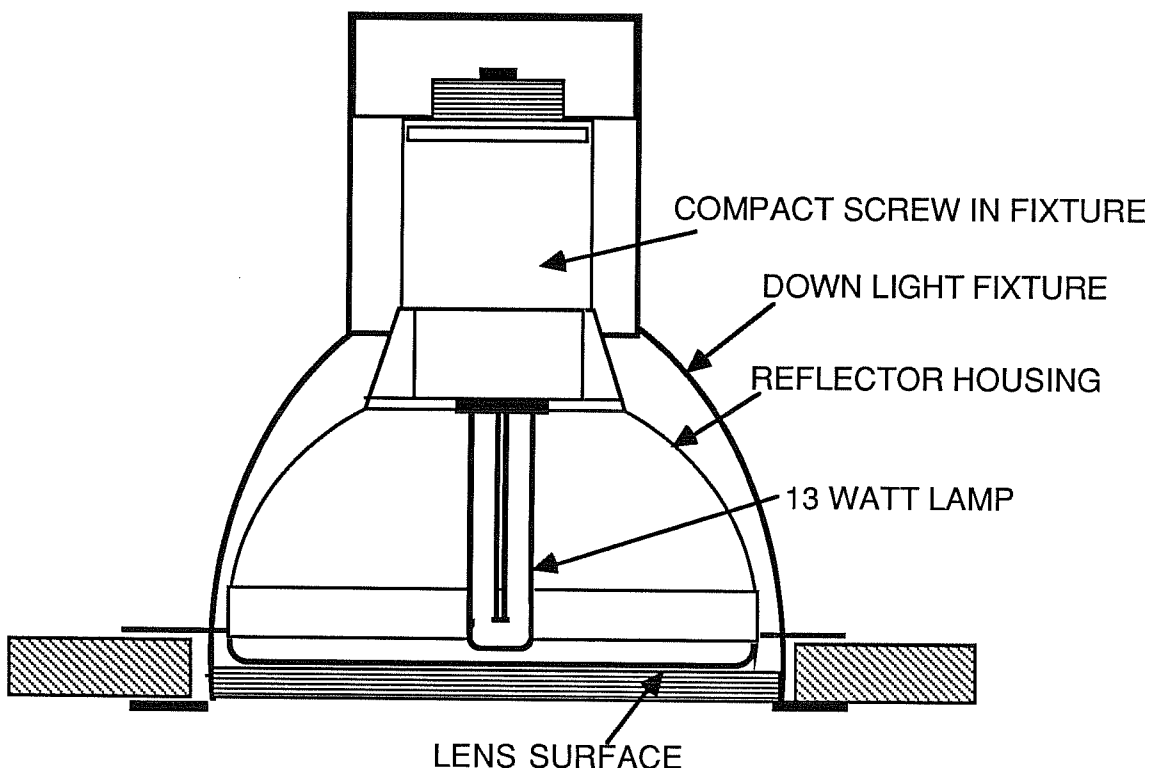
Compact 13 watt fluorescent fixture inside recessed fixture.
